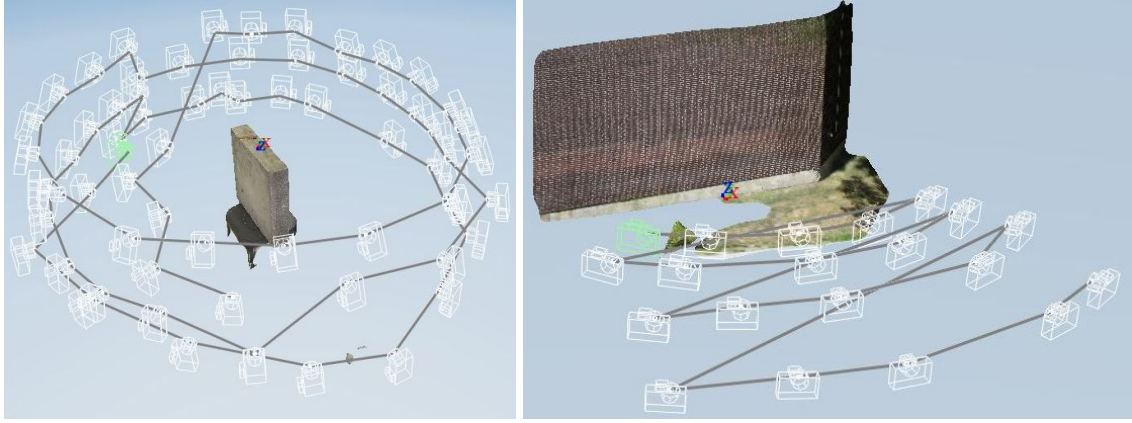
Typical photo acquisition for a lab specimen (left) and a masonry-concrete wall (right)
